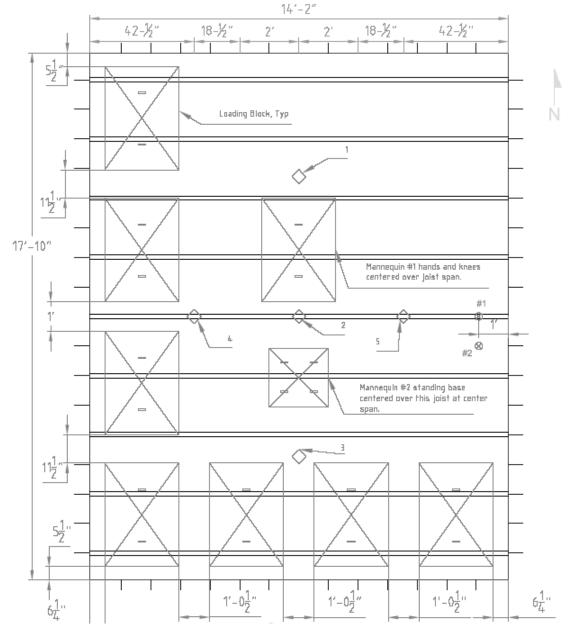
Loading and Instrumentation Layout (See Figure A.2.8).
